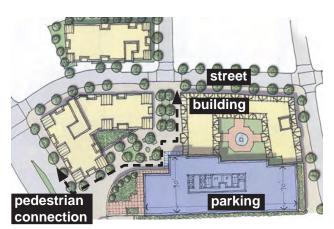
c.13: Site plan with access to parking behind buildings fronting the street and connections through the site to surrounding streets
